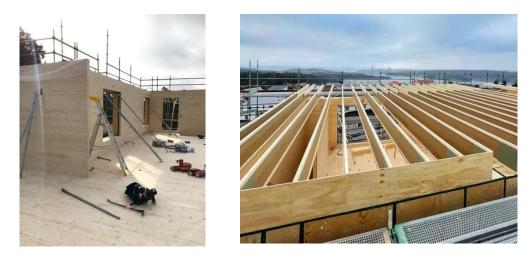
Mass timber panels for walls and intermediate floor(left); I-joist roof structure (right).
